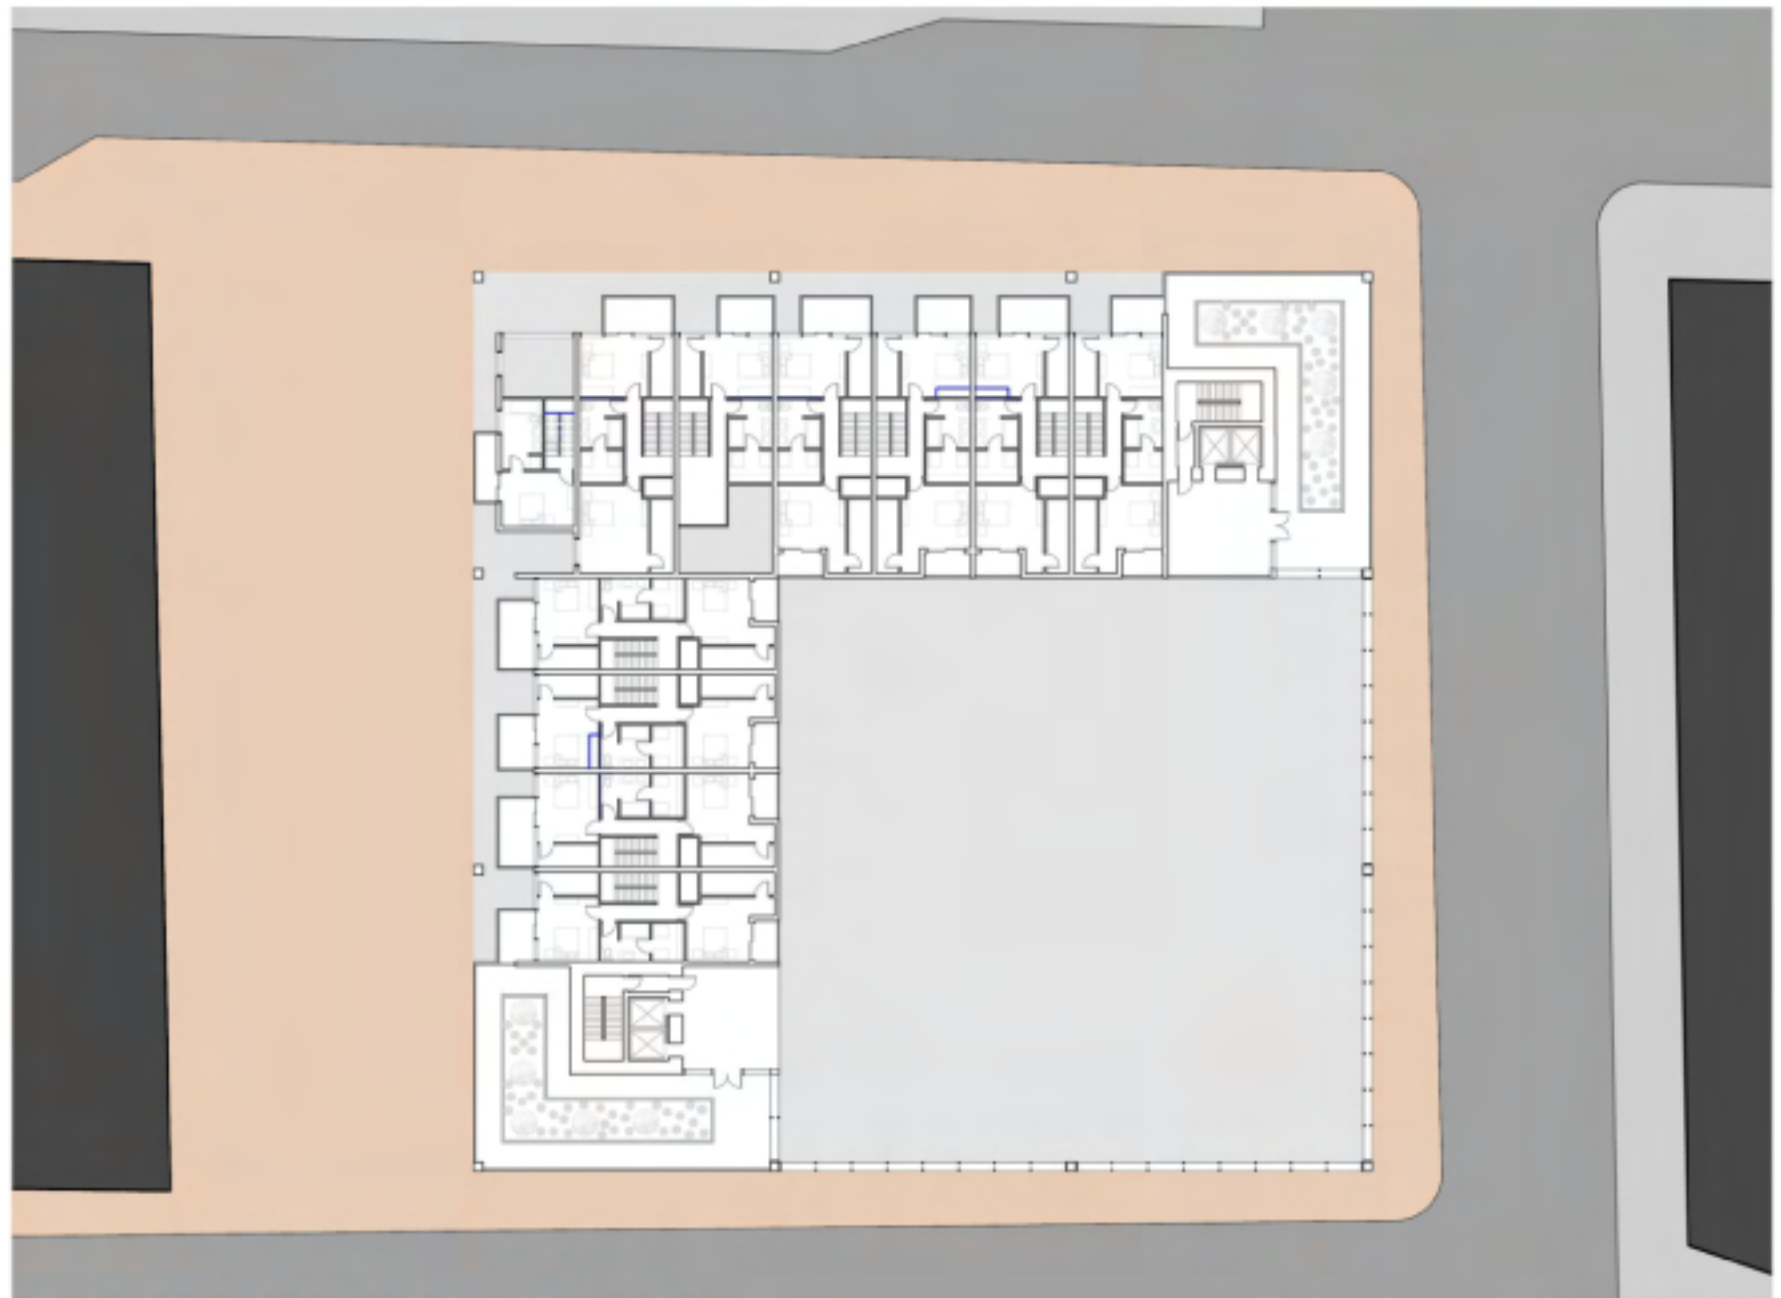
Eighth Floor Plan [Created using AutoCAD and Photoshop]
